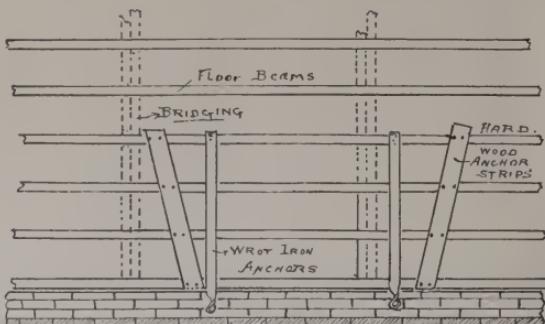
PLAN OF FLOORS SHOWING METHOD OF ANCHORING FRONT AND REAR WALLS TO BEAMS
